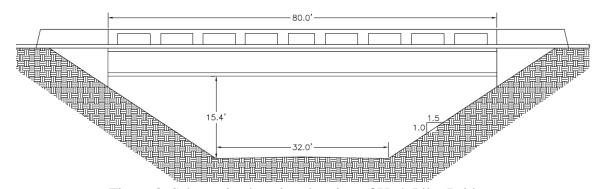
Schematic elevation drawing of Utah Pilot Bridge.
